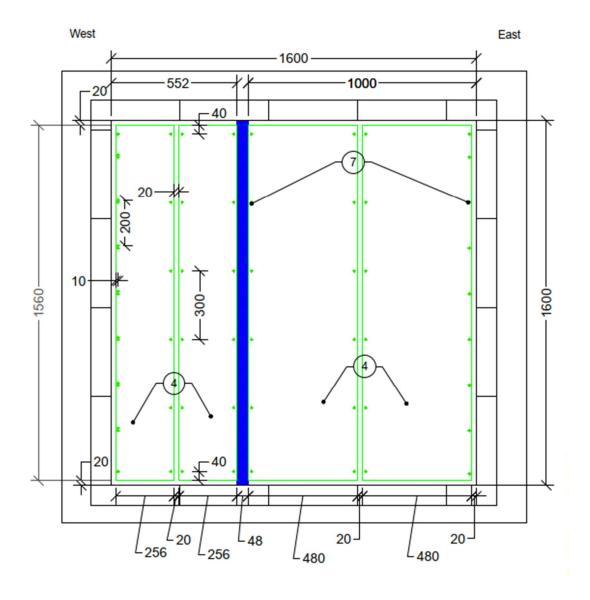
Elevation view of the second layer of plaster board (unexposed side)
